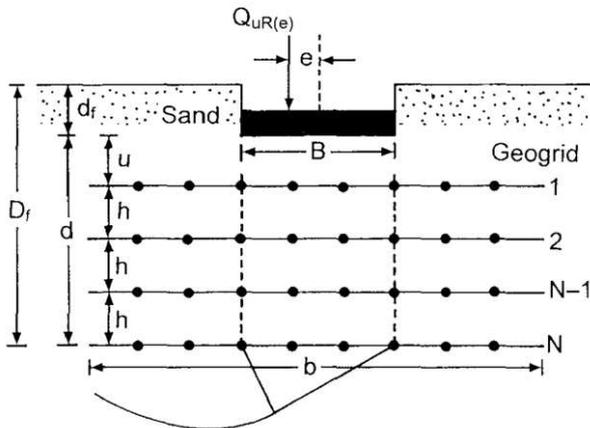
Assumed failure mode under an eccentrically loaded strip foundation on geogrid-reinforced sand.
